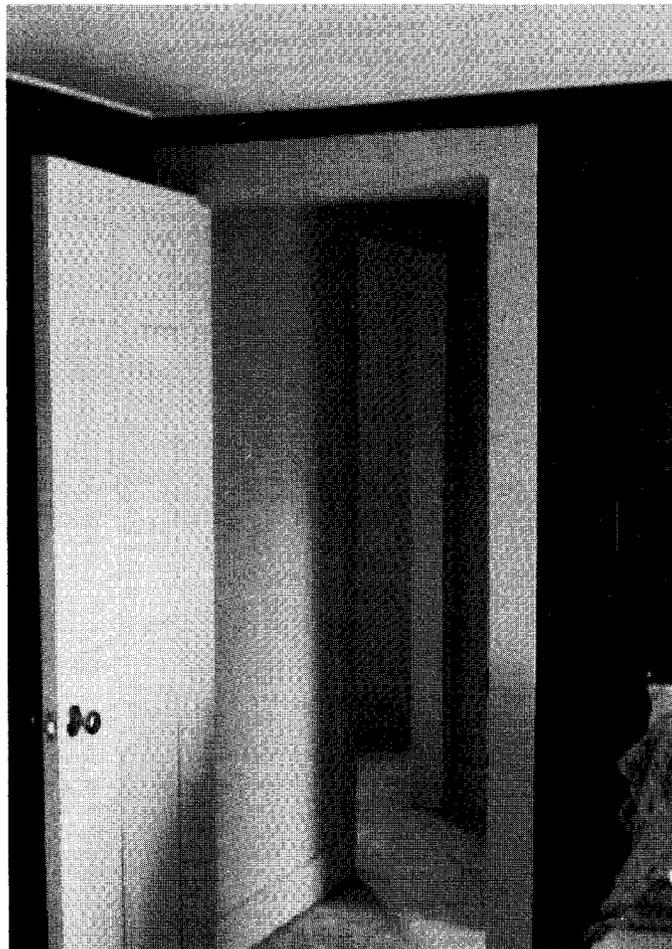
Room 204, trim of north doorway (may date to 1900 renovation).
